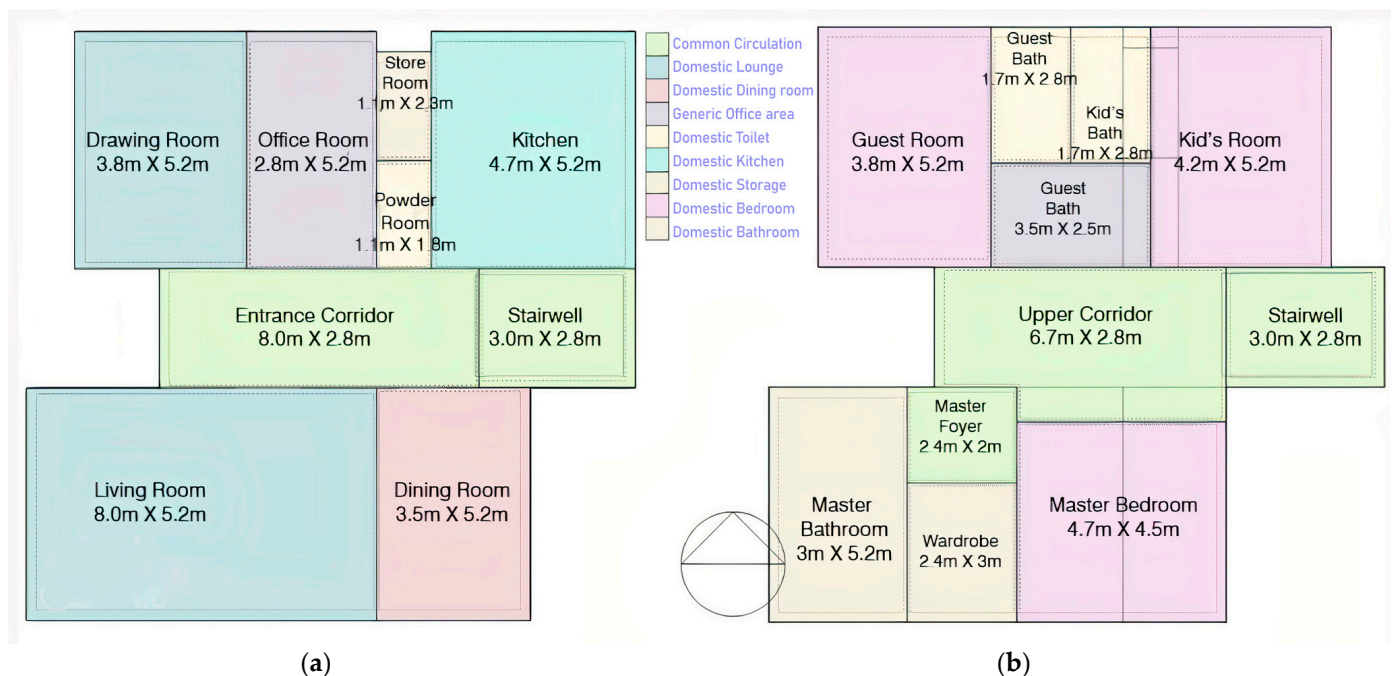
Floor plans drawn in DesignBuilder according to activity zones: (a) ground floor plan; (b) first floor plan.
